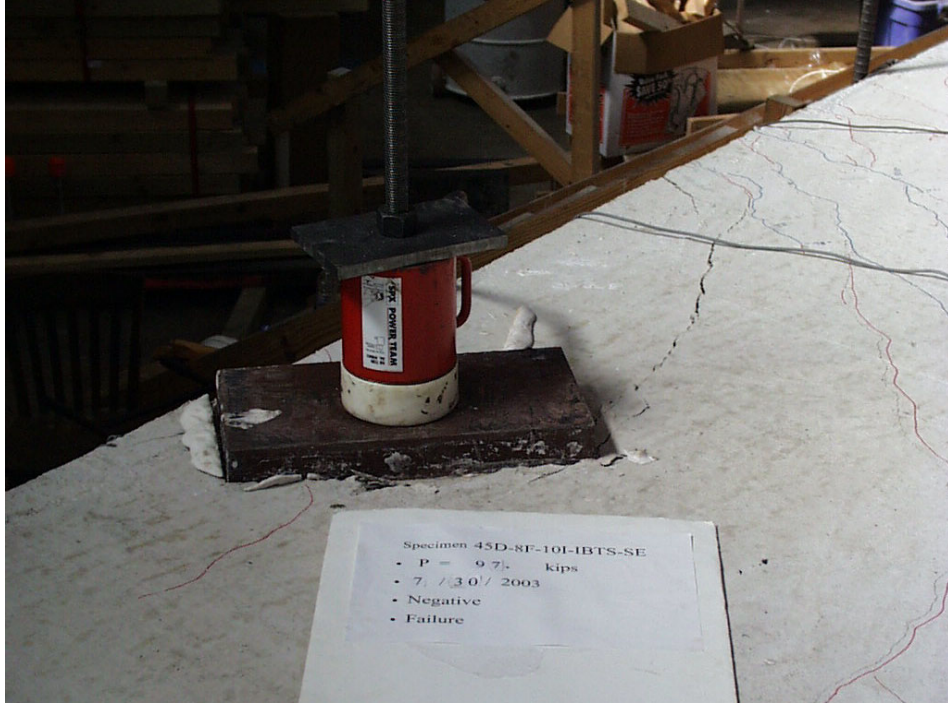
Interior bay failure surface at bottom of slab, facing west
